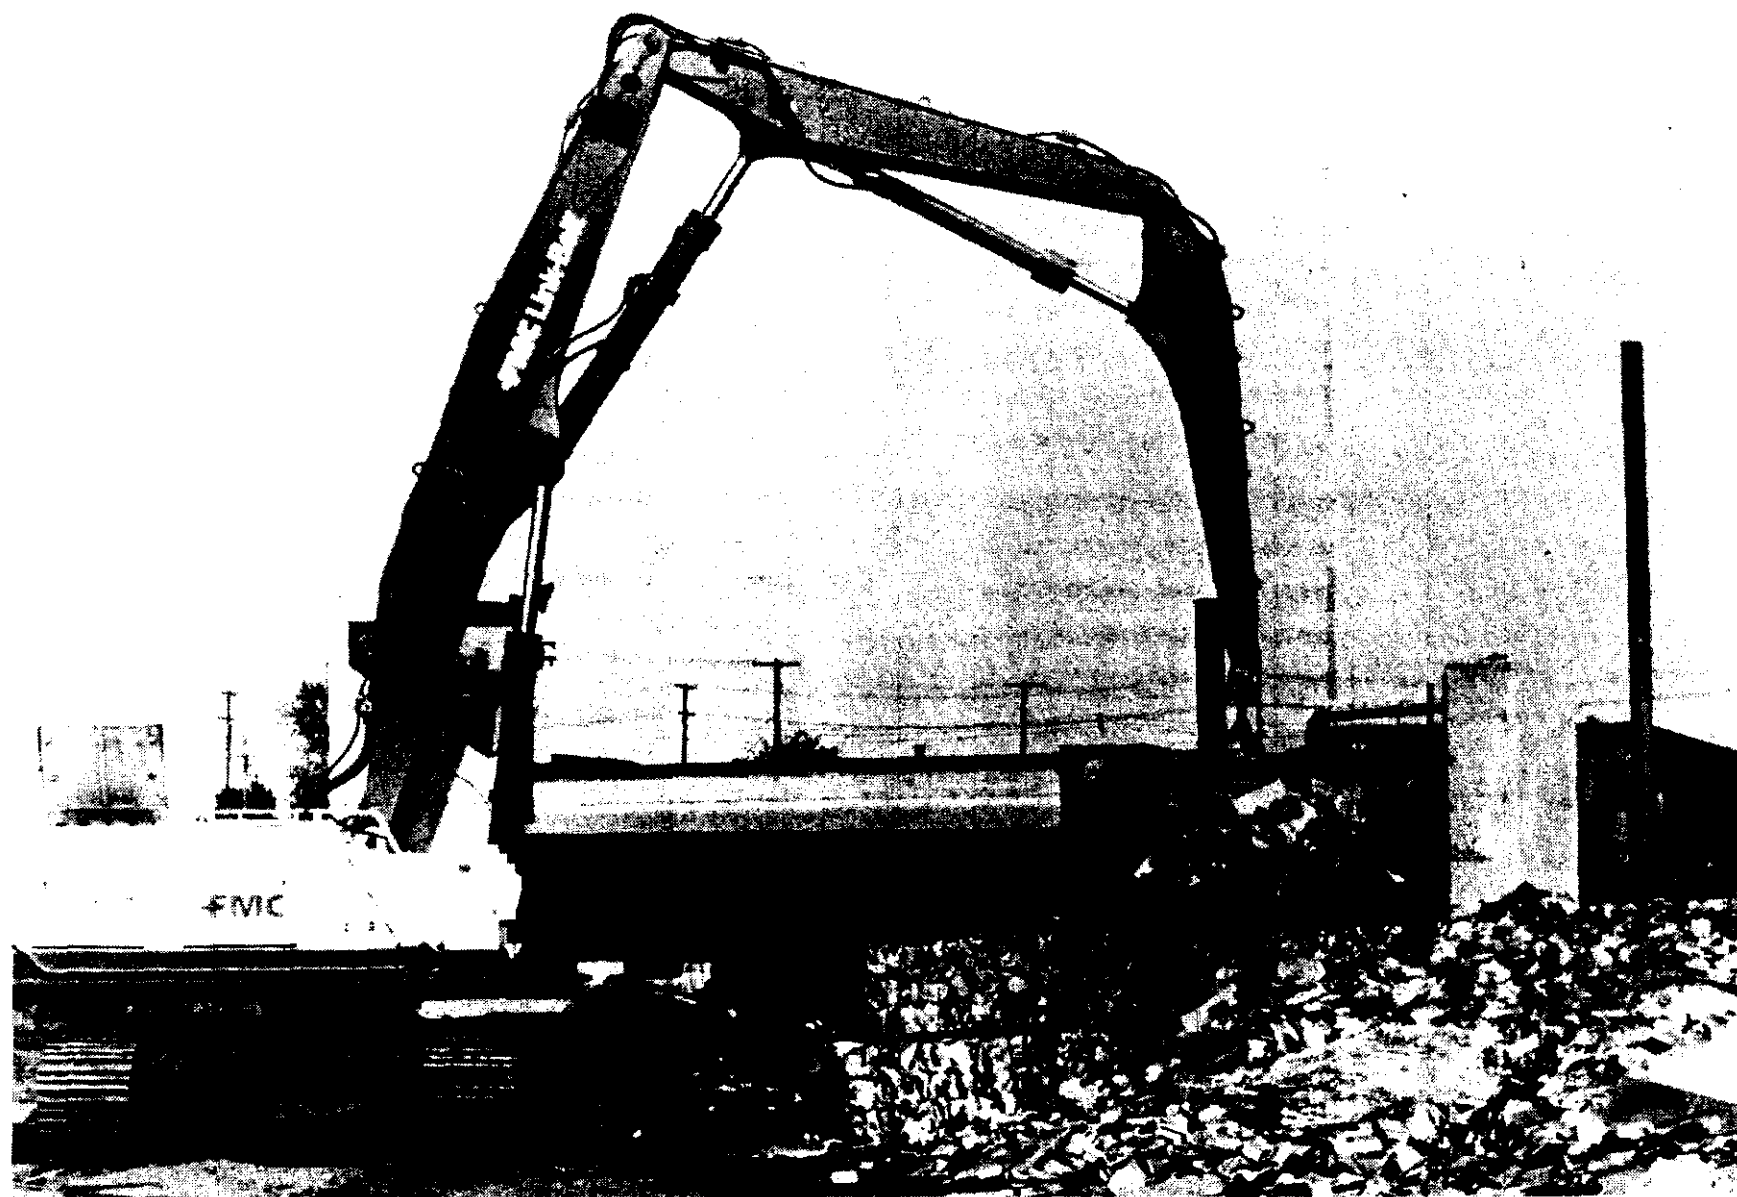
Crawler mounted, hydraulic knuckle-boom crane with magnet.
